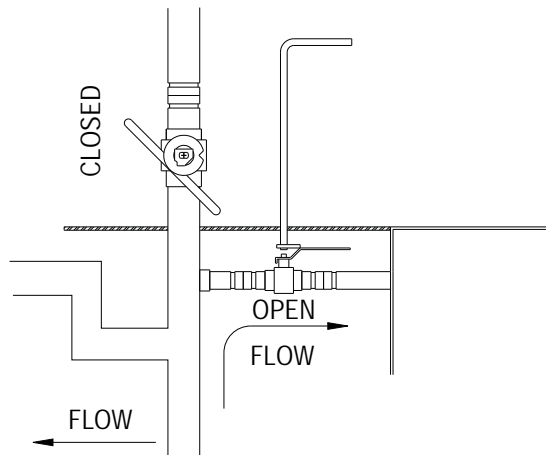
Discharge Through Extension Hose or Hose Reel Through Remote Port
